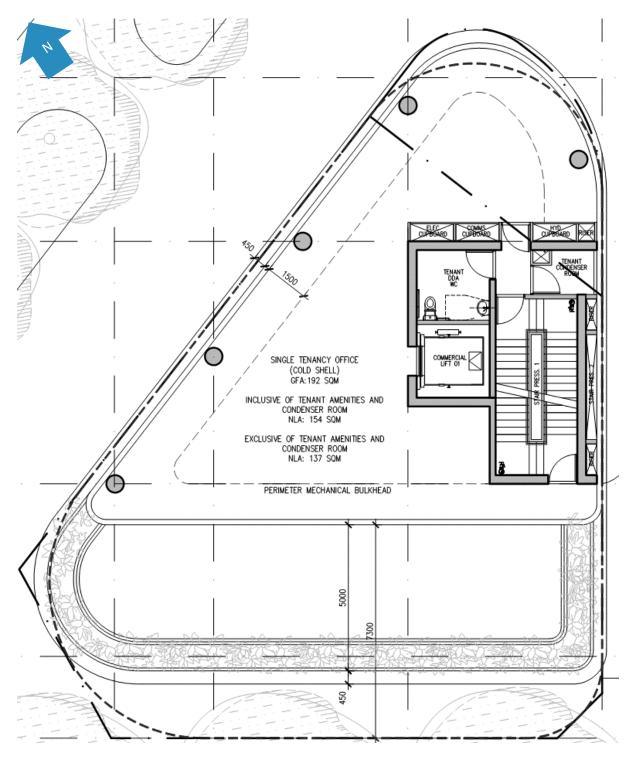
Proposed Floor Plans – Level 12 (Image Source: Elenberg Fraser)
